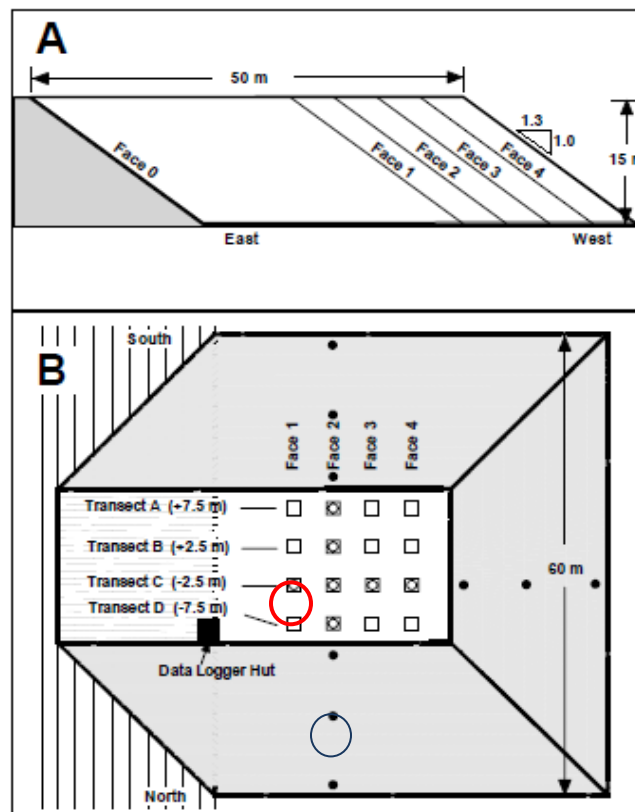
A) Schematic side view of the Type III test pile showing the location of the instrument faces. B) Schematic plan view representing the Type III test pile. Open squares represent the surface location of gas sampling bundles installed along the tip faces. Open circles represent the gas sampling bundles connected to the gas pressure datalogging system. Filled circles represent single pressure sampling locations on the surface of the test pile (Reproduced from Amos et al.,
